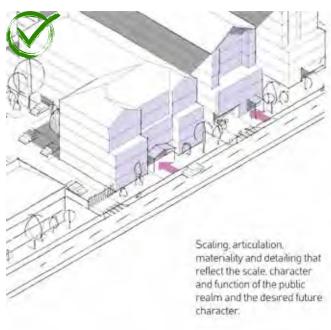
Multiple Dwellings - Facade Design Example Diagram
